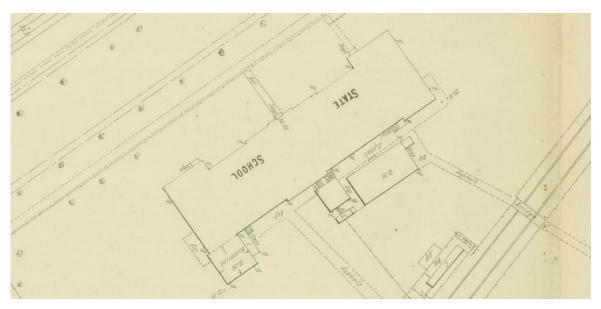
, Detail from MMBW Detail Plan No. 1383 (September 1987) showing the original 1875 building, water closet marked "C" and unknown building with relative level of "21.35" and a downpipe in the corner.
